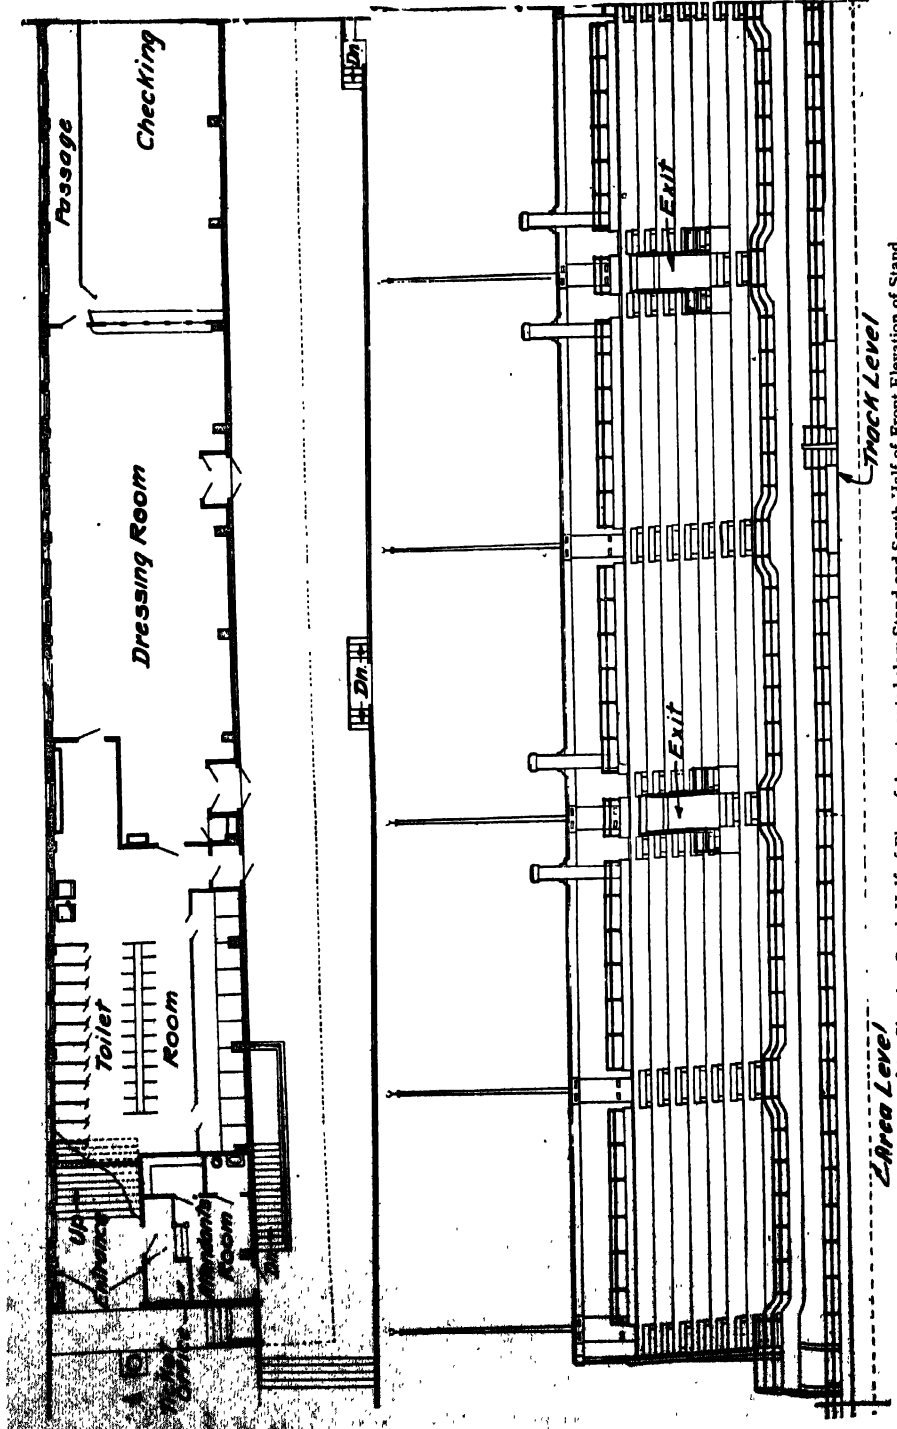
and 3. Showing South Half of Plan of Apartments below Stand and South Half of Front Elevation of Stand.
